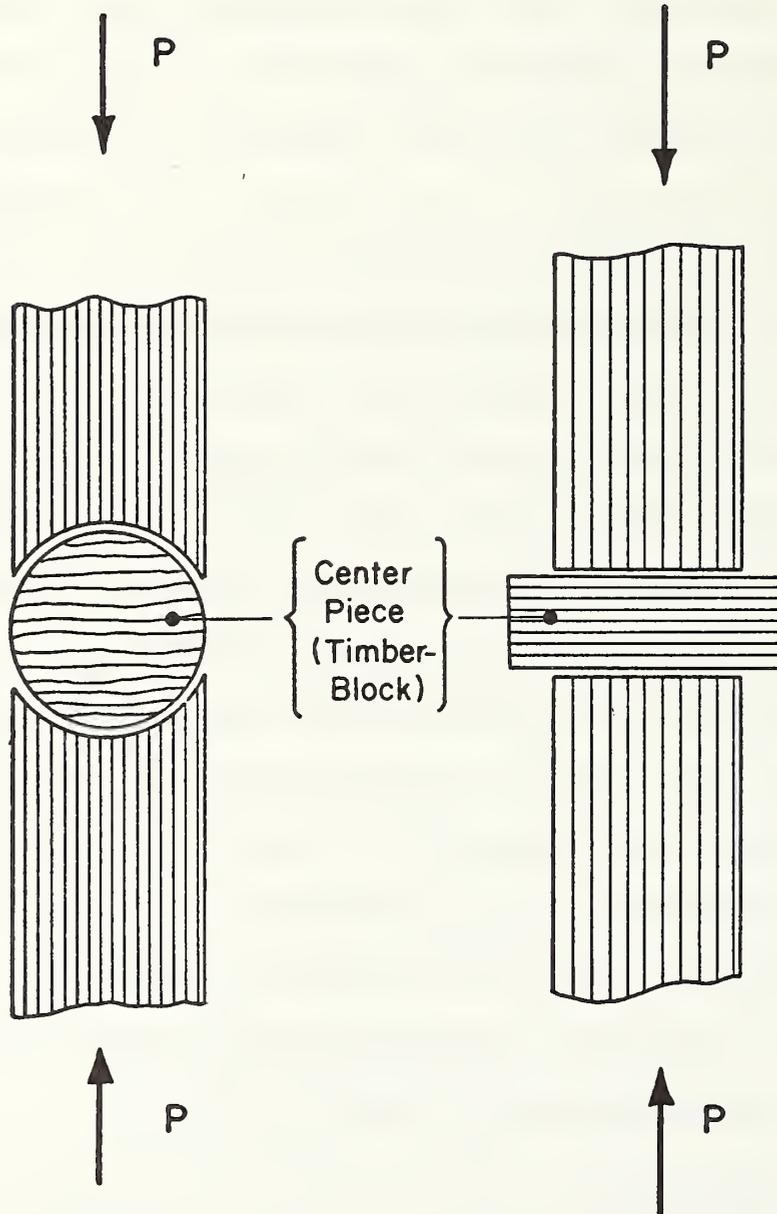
LOAD TESTS ON TIMBER BLOCKS
